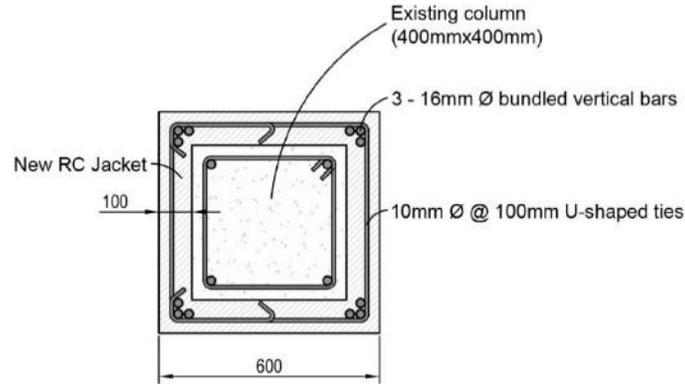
Retrofitted column with RC jacket (RS1): cross-section and reinforcement.
